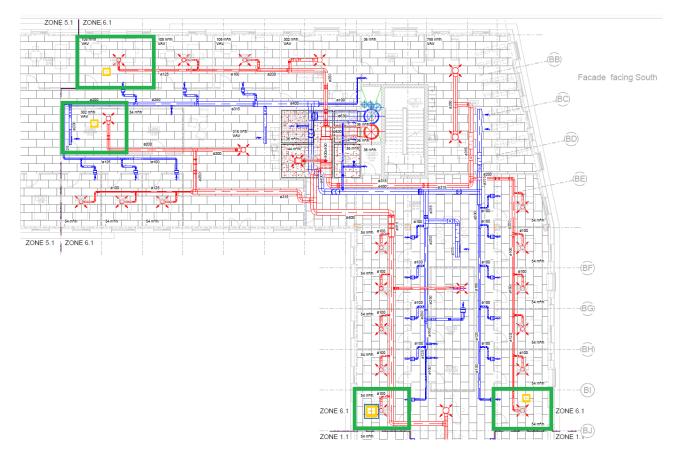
Location of the rooms of interest with additional monitoring equipment on the 1st floor of the Zone 6 in the CREATE test building.
